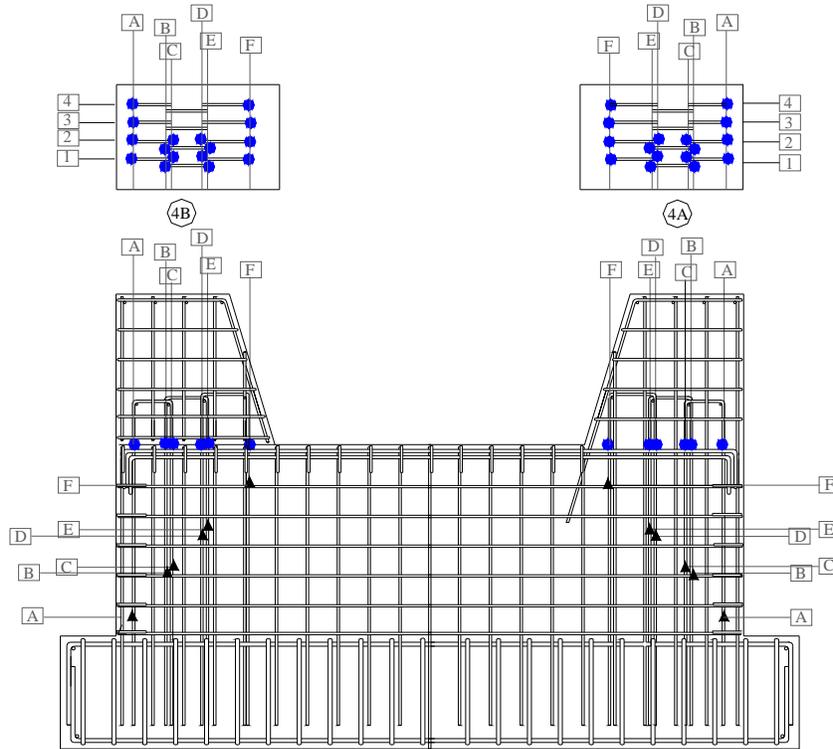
11- Labels of Strain Gages on U Shape Vertical Bars, in Horizontal direction- Test Series IV
